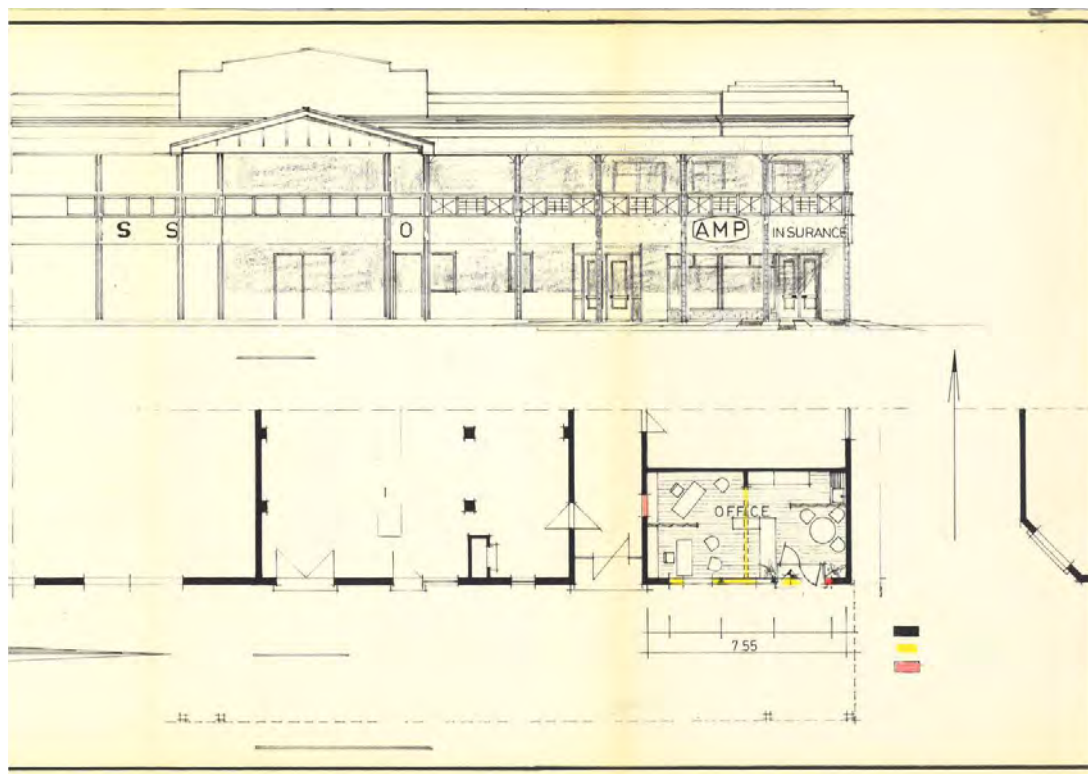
Ground floor plan and East Elevation, undated, alterations to replace parlor with additional space for the tenancy
